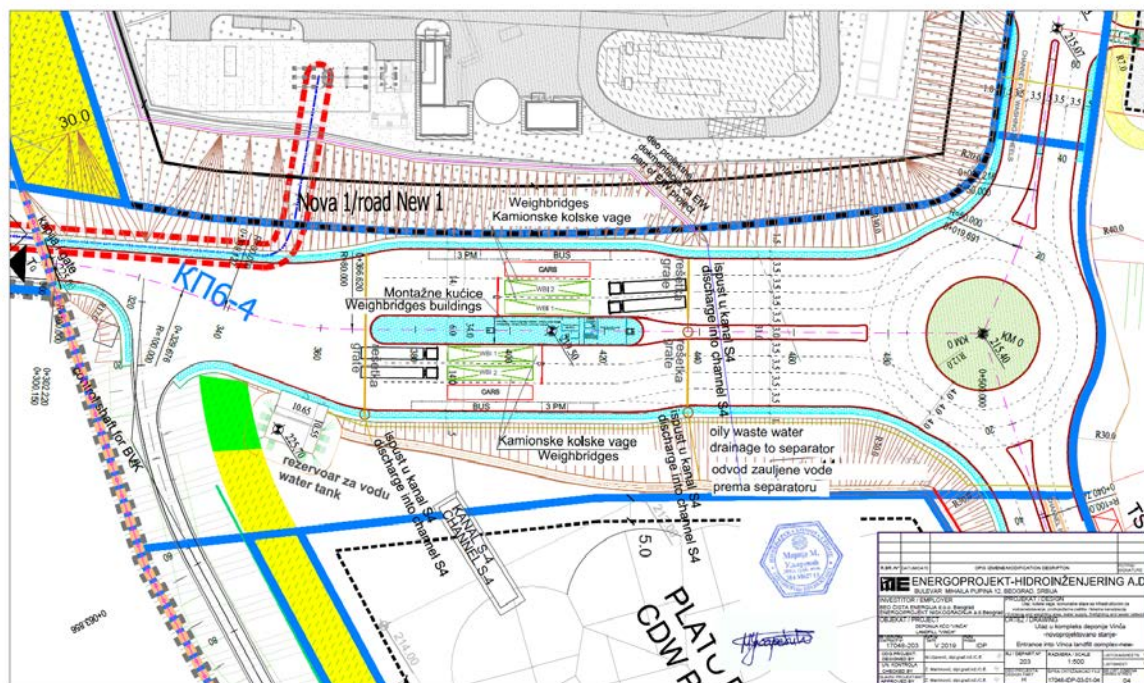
Layout of the Control zone at the entrance (Source: IDP Book 3/1 Hydrotechnical Installations Design, Energoprojekt Hidroinženjering, May, 2019)
